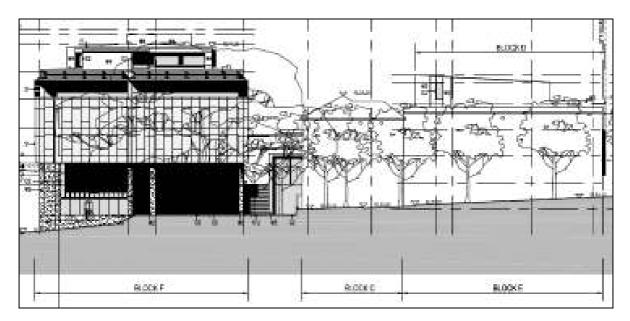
North (Napier/Oxford Street) Elevation of Building F
